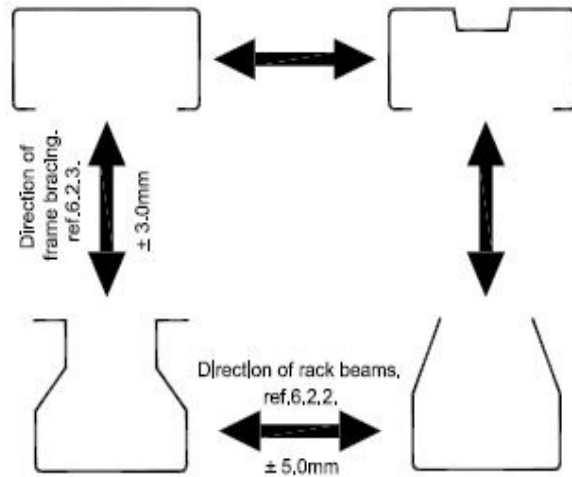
Showing Typical Upright Sections & Method of Measurement
